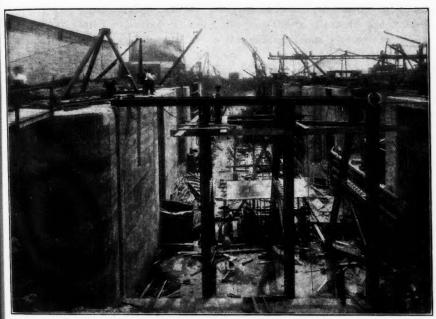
EMERGENCY DAM UNDER CONSTRUCTION. TRESTLE BENTS IN SERVICE POSITION AND CONNECTED BY STRINGERS OF SERVICE BRIDGE DECK.
